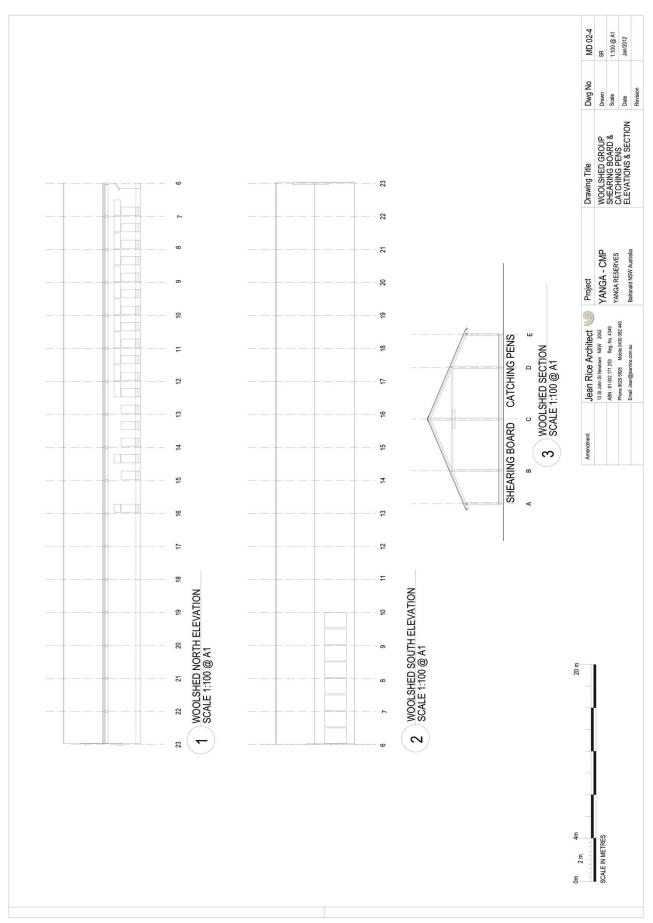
Woolshed Group. Woolshed - Shearing Board and Catching Pens elevations and cross section. Jean Rice Architect, site assessment 2009.
